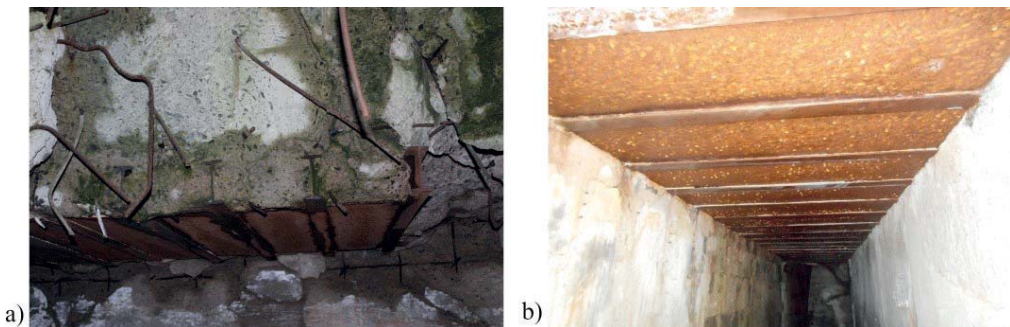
a) Composite slab on steel beams cross-section, b) the view of the slab in good condition (own photos)
